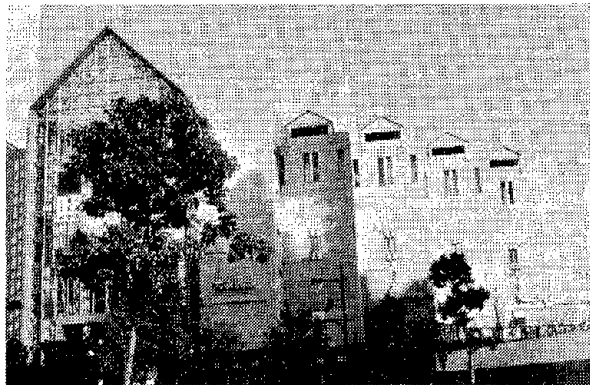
Exterior view of a damaged building; post-1981 construction
